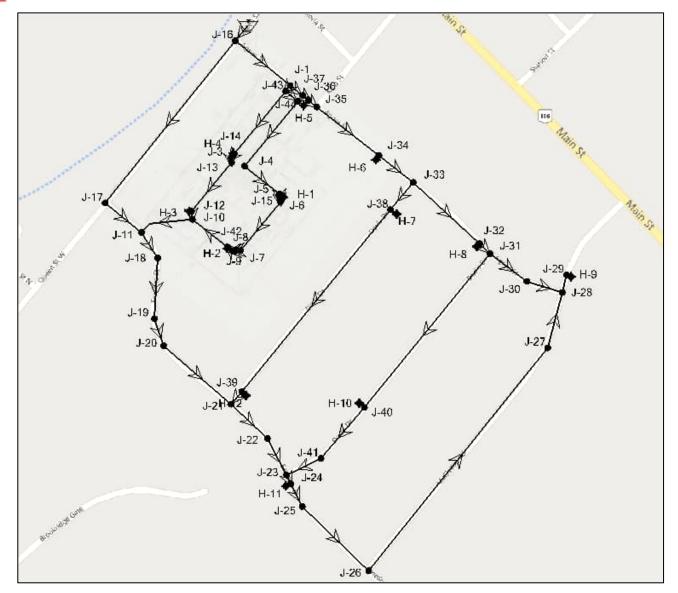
Agnes St Subdivision & Local Network Layout with Junction and Hydrant IDs
